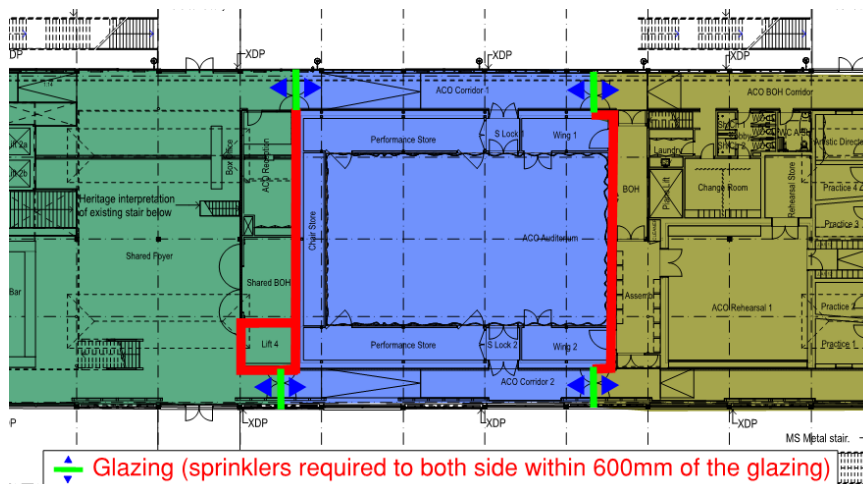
Level 1 and 2 - Glazed wall and doors separating ACO fire compartment - Indicative illustration of sprinklered glazing (to be located on both sides of glazing)
